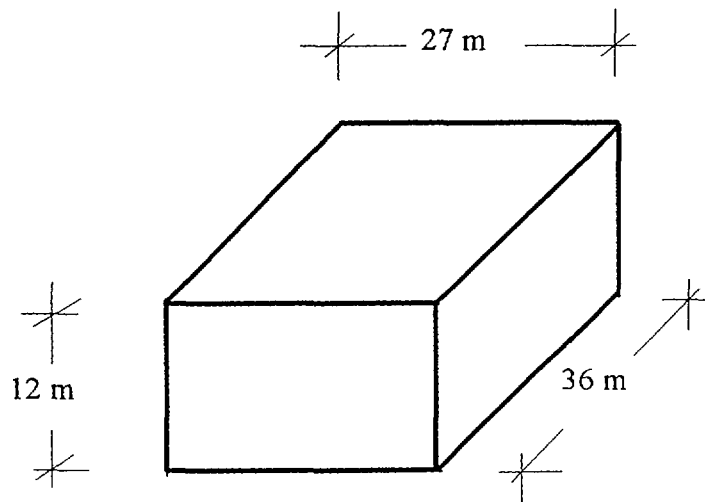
Reinforced concrete building with thick walls and slabs: Auxiliary building concrete block
